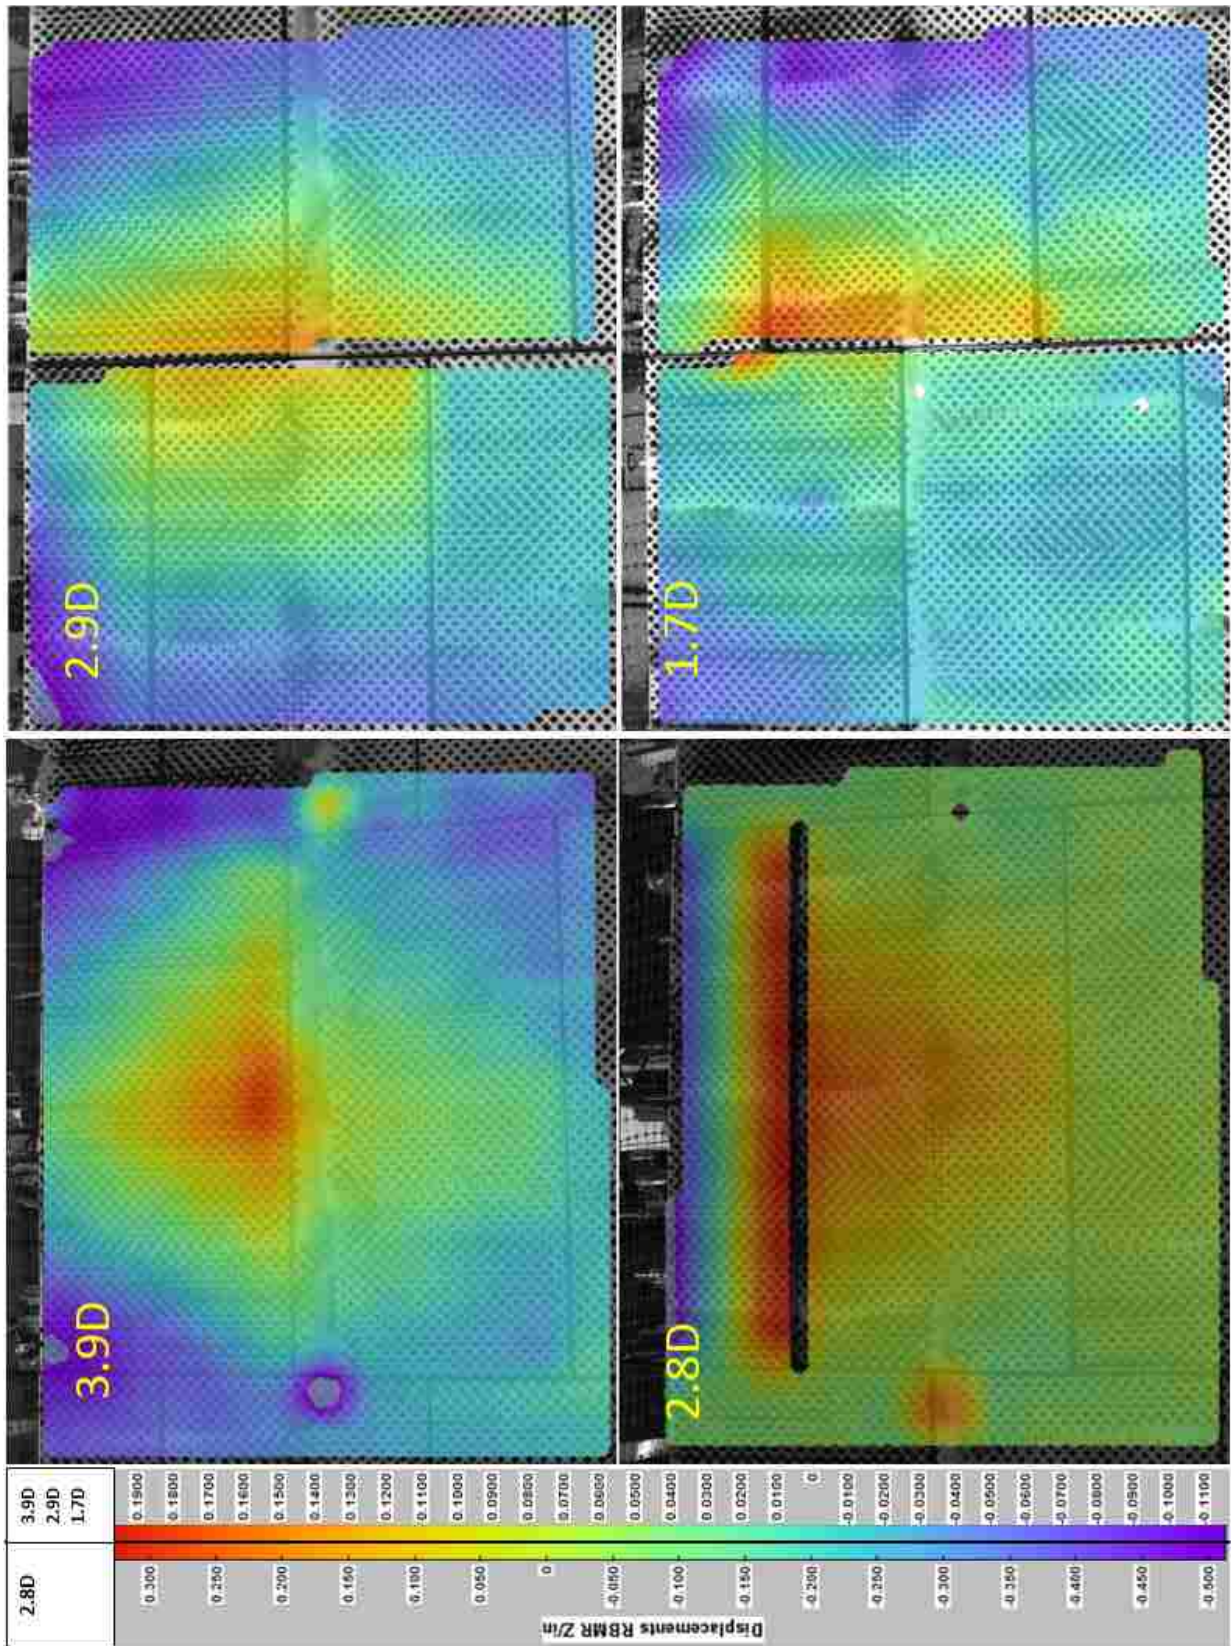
Wall panel displacement at 3.0 in. pile head deflection. Note different scale on 2.8D.
